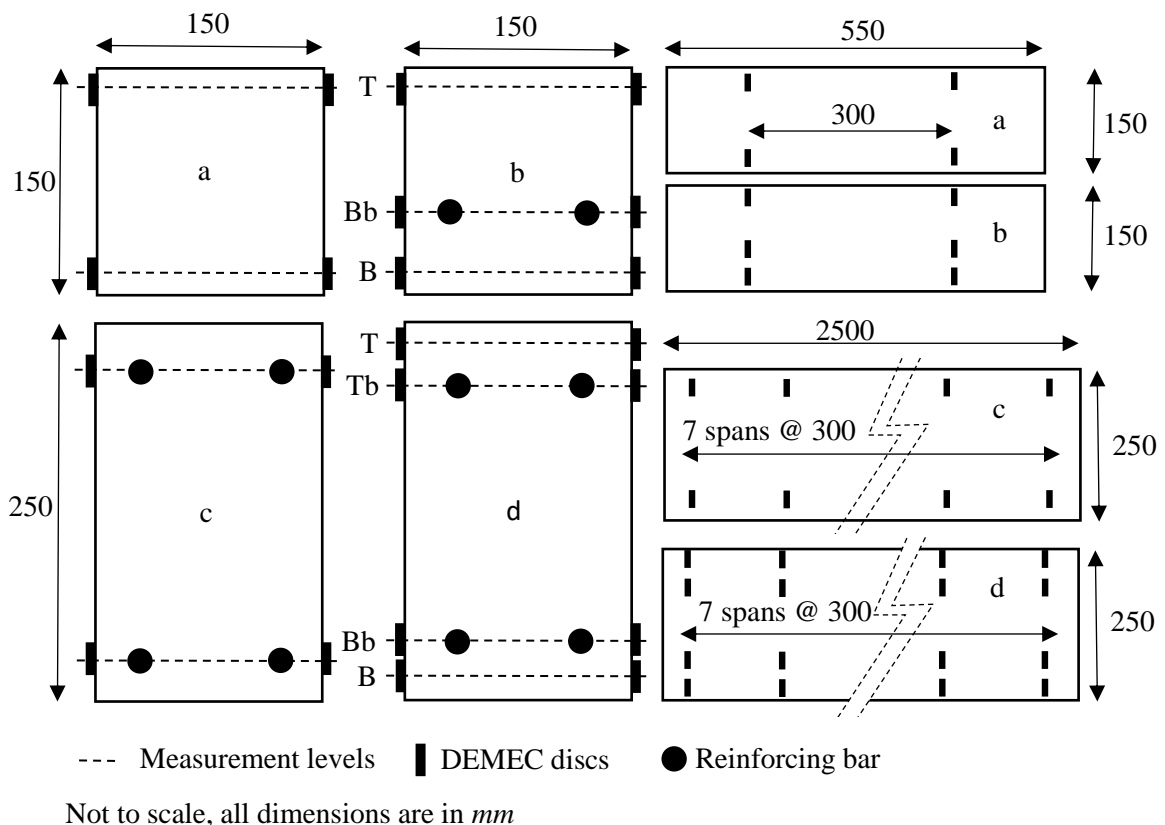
Cross section, geometry, reinforcement layout and shrinkage measurement levels of plain prism (a), RC prism (b), RC beams with concrete cover of 20 mm (c) and 40 mm (d).
